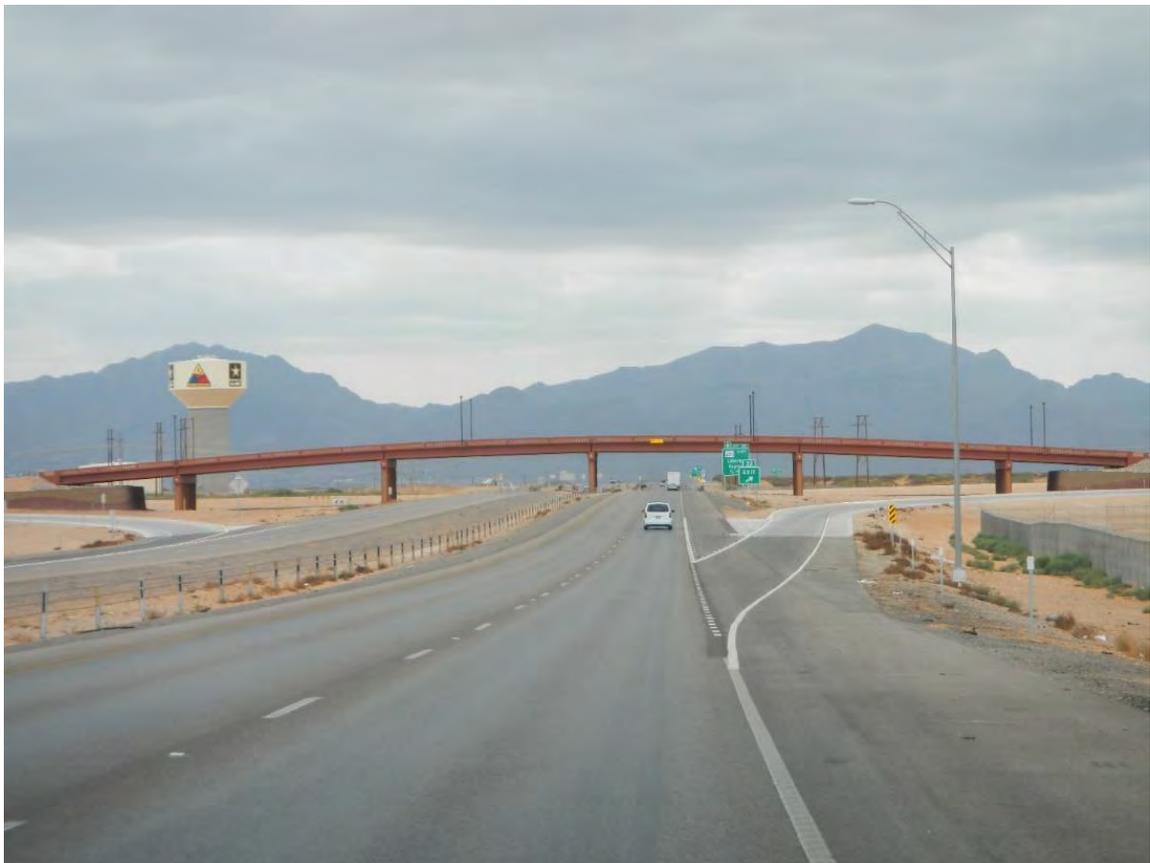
Existing Intersection at Loop 375 and Iron Medics Drive, Facing North
